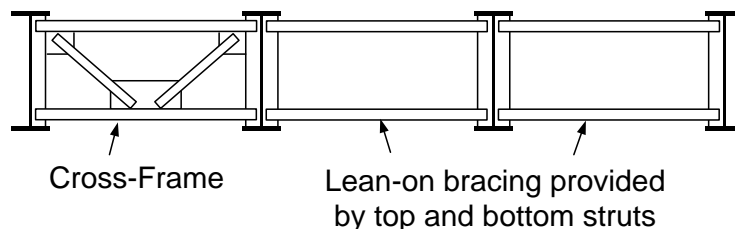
A bridge cross section showing multiple I-girders braced by a single cross frame.
